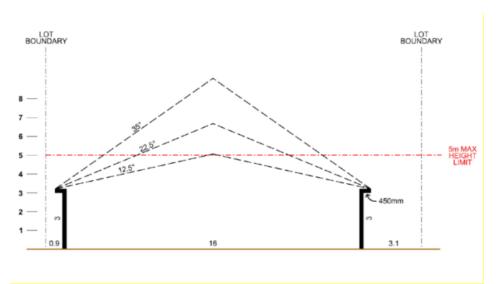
Five(5) metre maximum building height limit compared to roof pitches
